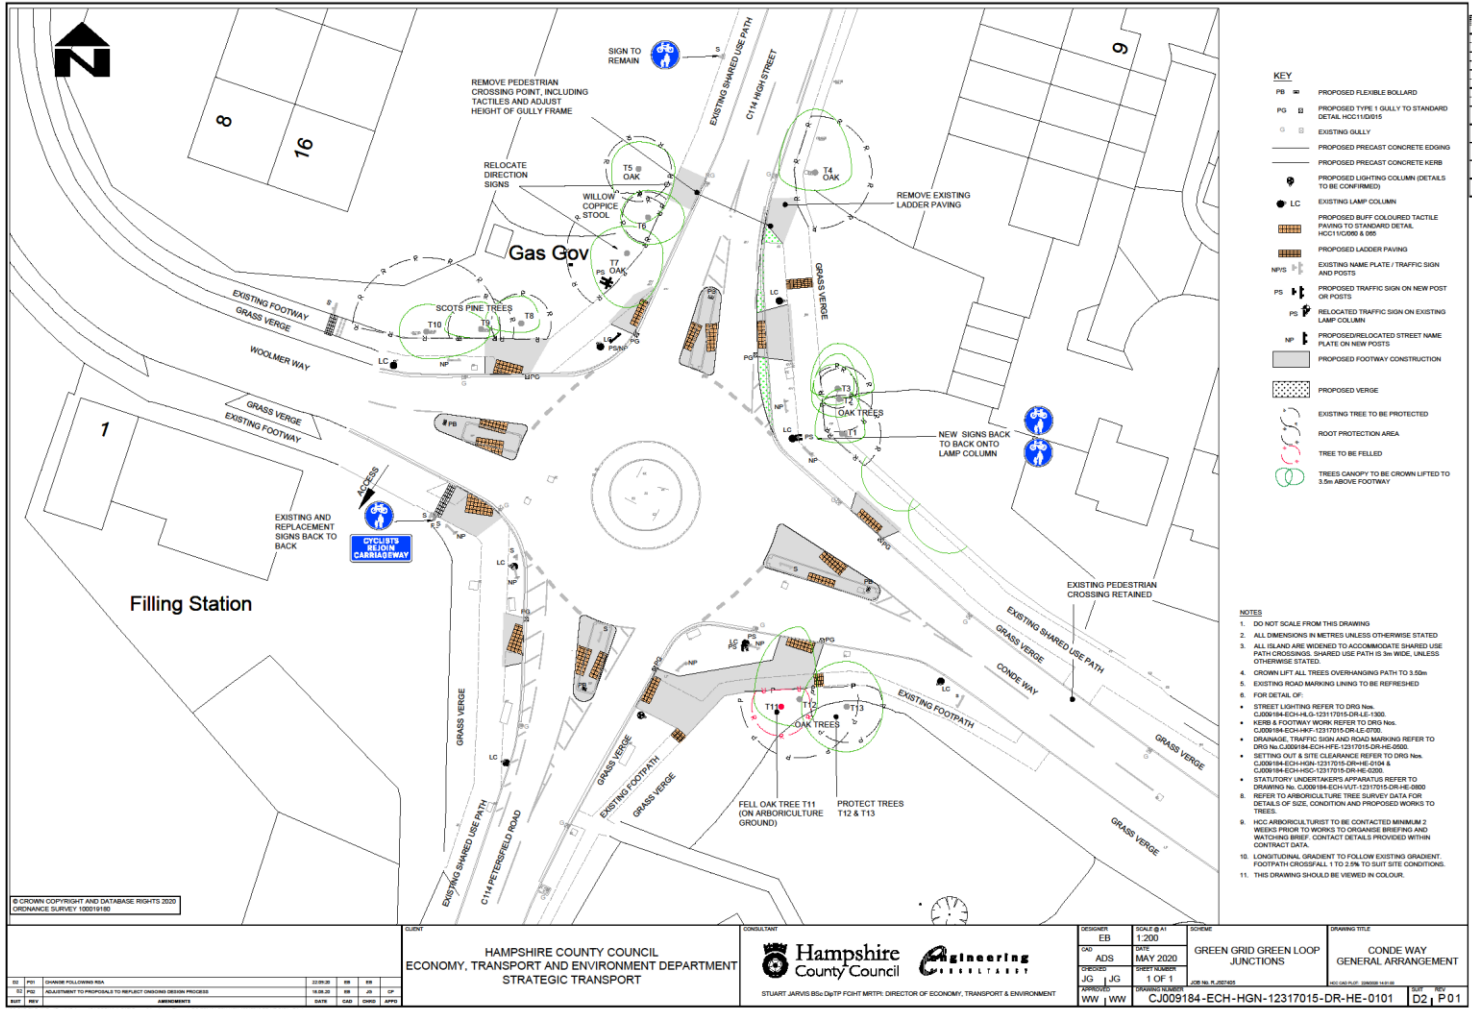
Conde Way Roundabout Improvements – General Arrangement
